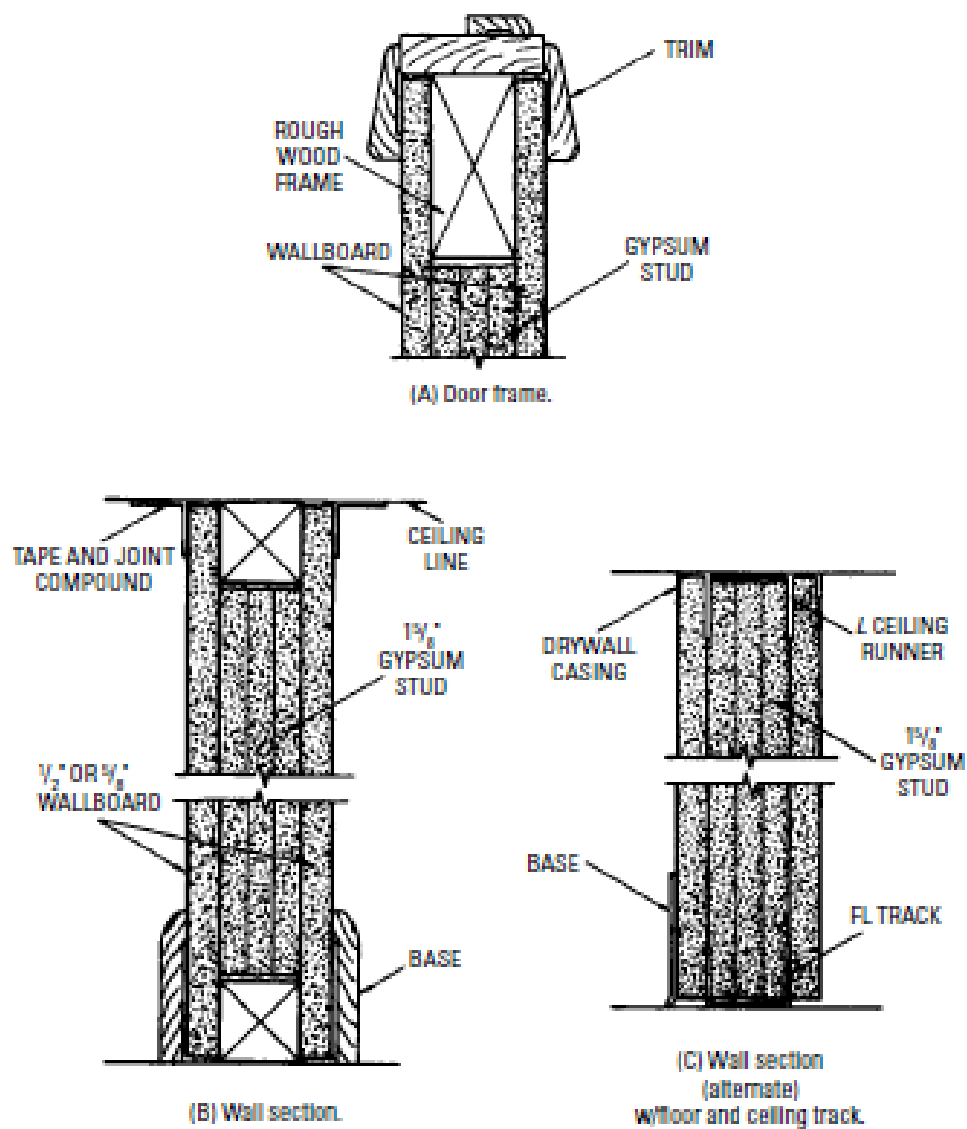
Cross-sectional view of a semisolid all-plasterboard wall. (Courtesy National Gypsum Co.)
